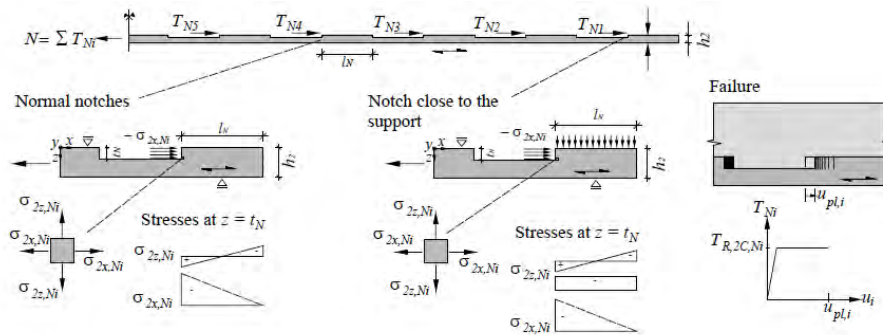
Cantilever model by Boccadoro for the prediction of Timber Compression Failure (TCF) in the notch for traditional TCC floors with a 'thick' cracked concrete slab [4].
